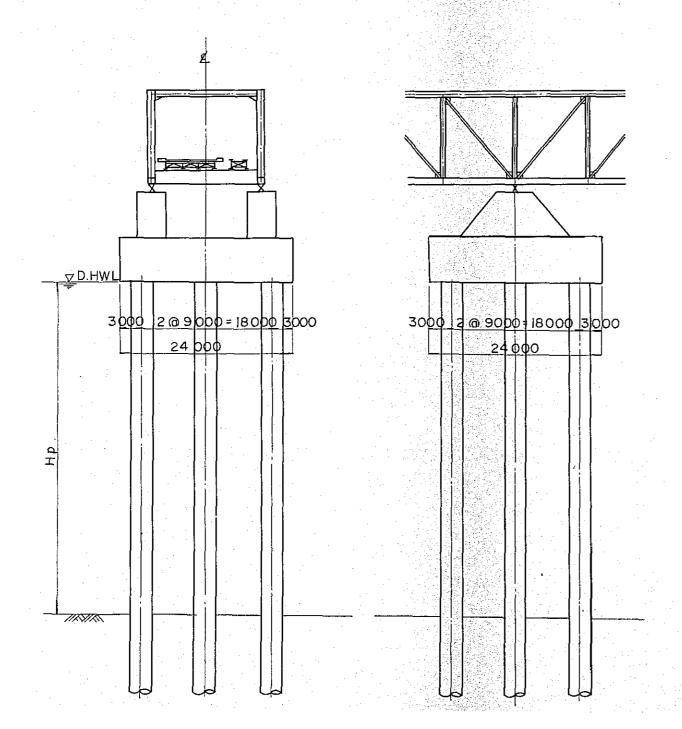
Outline of structure of multi-pile foundation ø3.0 m
